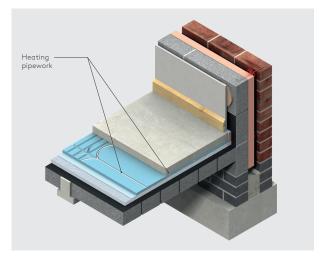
Intermittent heating applications - installed onto beam and block floor underneath screed
